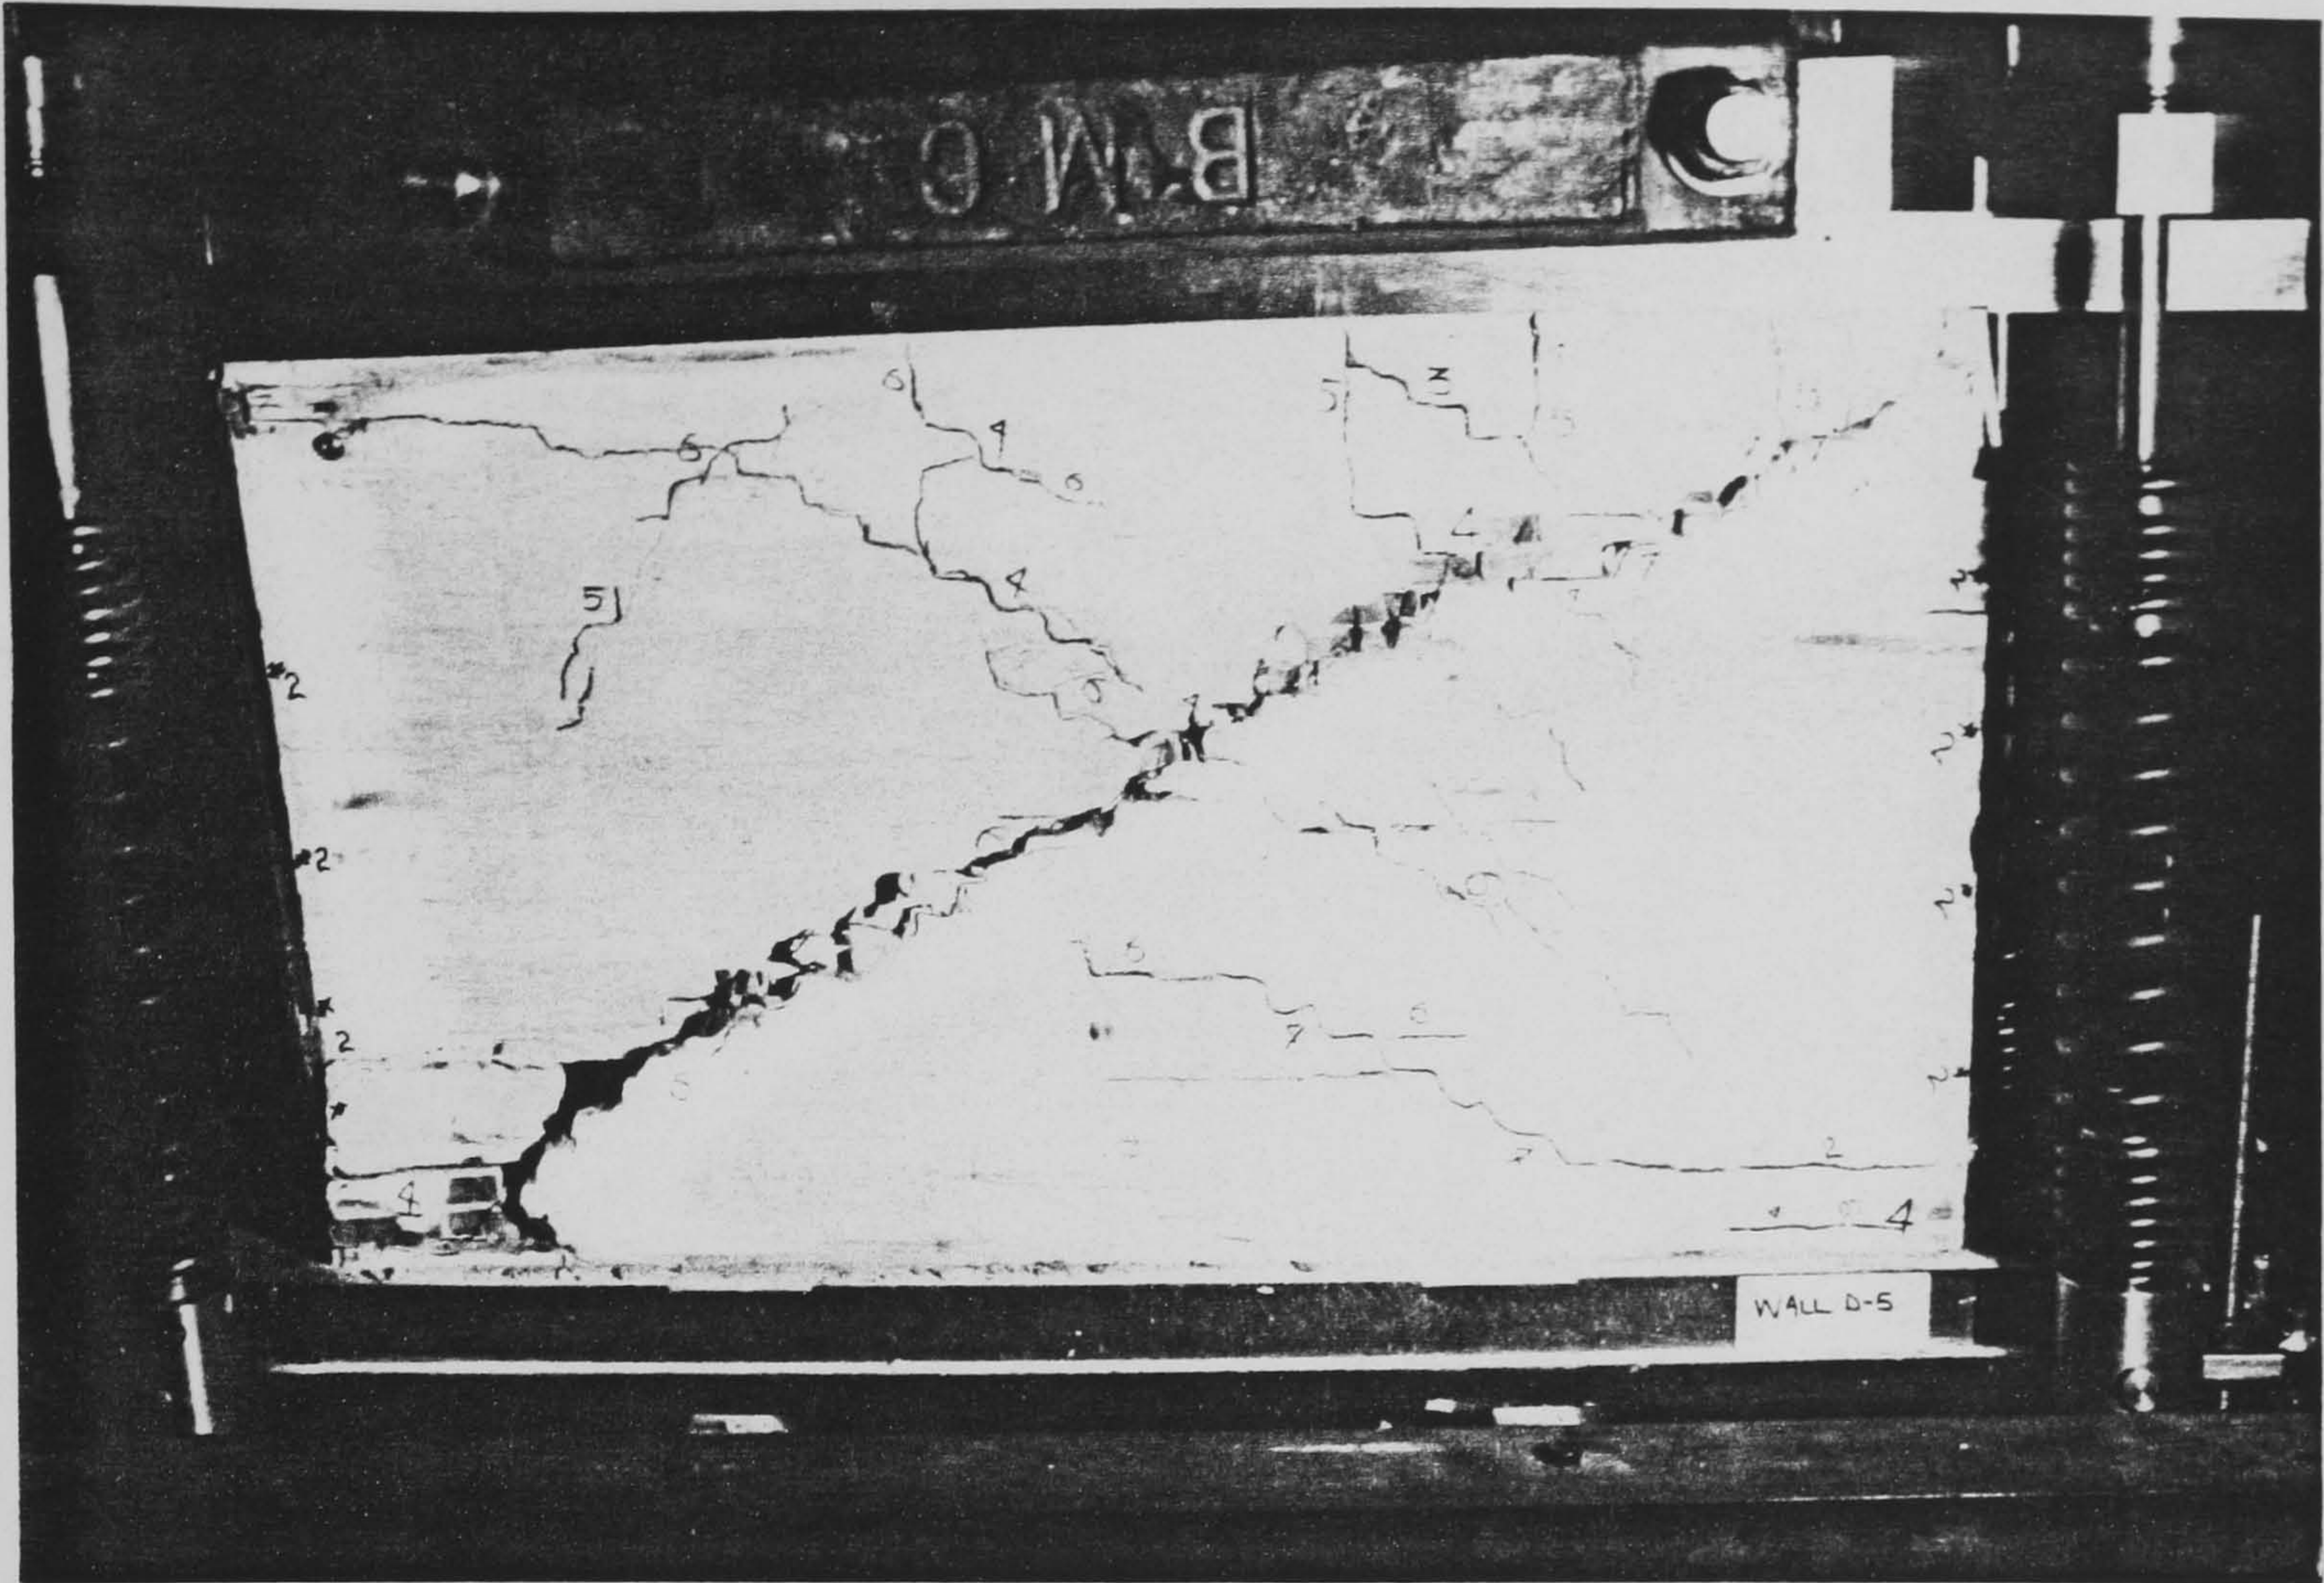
Collapse sequence-frame 5 (wall-D)
